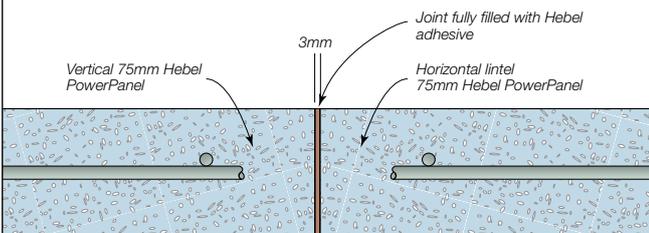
Lintel junction detail with 50mm seating - SECTION AA
